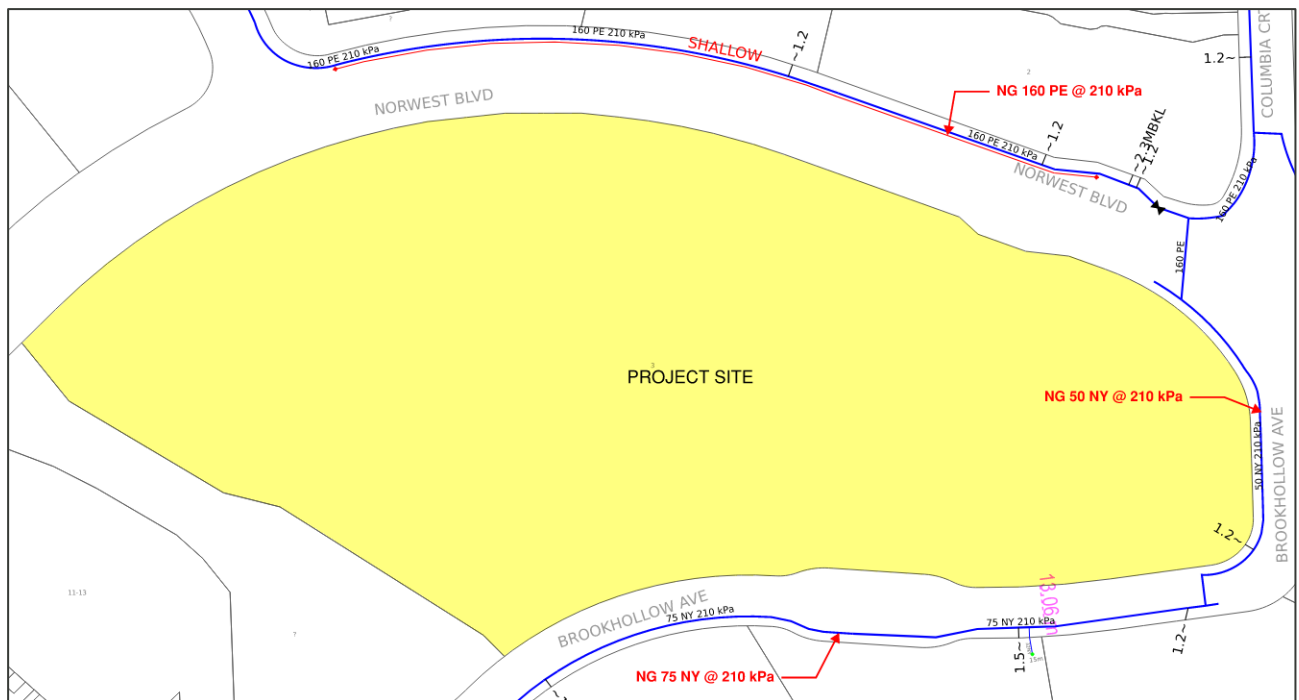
Natural Gas Assets in proximity to the site (Jemena BYDA plan)
